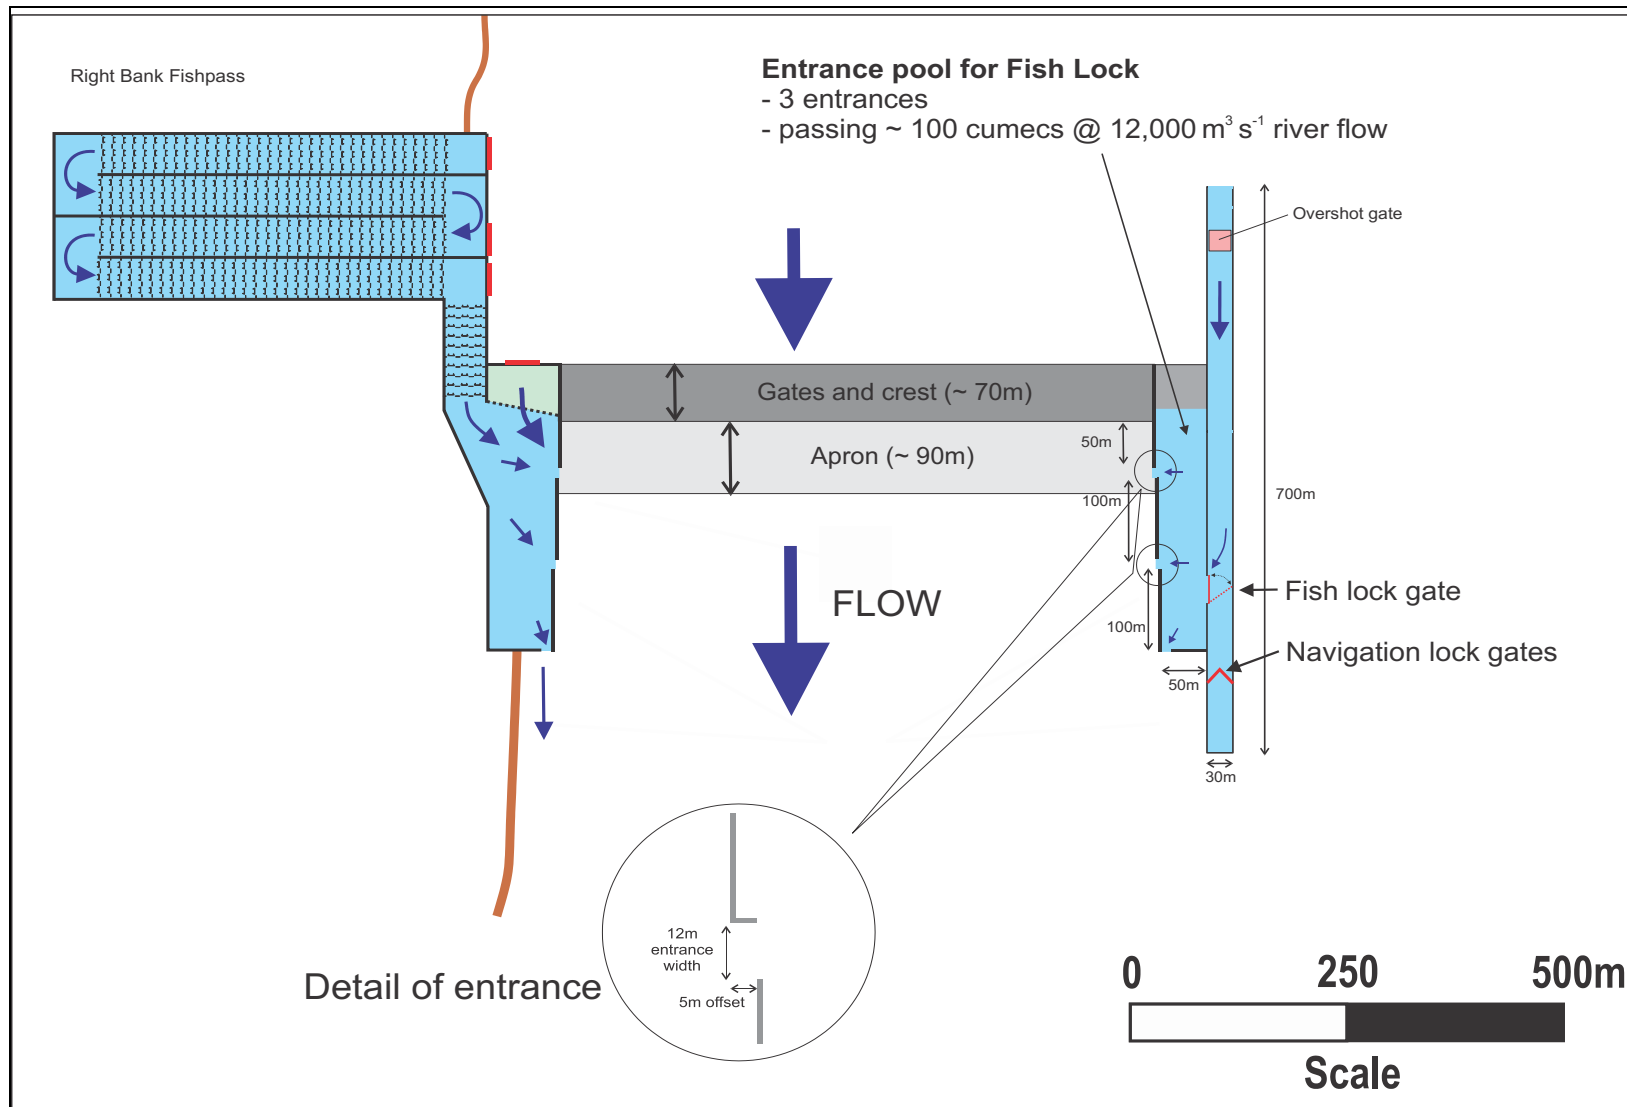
Plan view of navigation/fish lock showing the location with respect to the dam spillway and the right bank fishpass. Powerhouse not shown.
